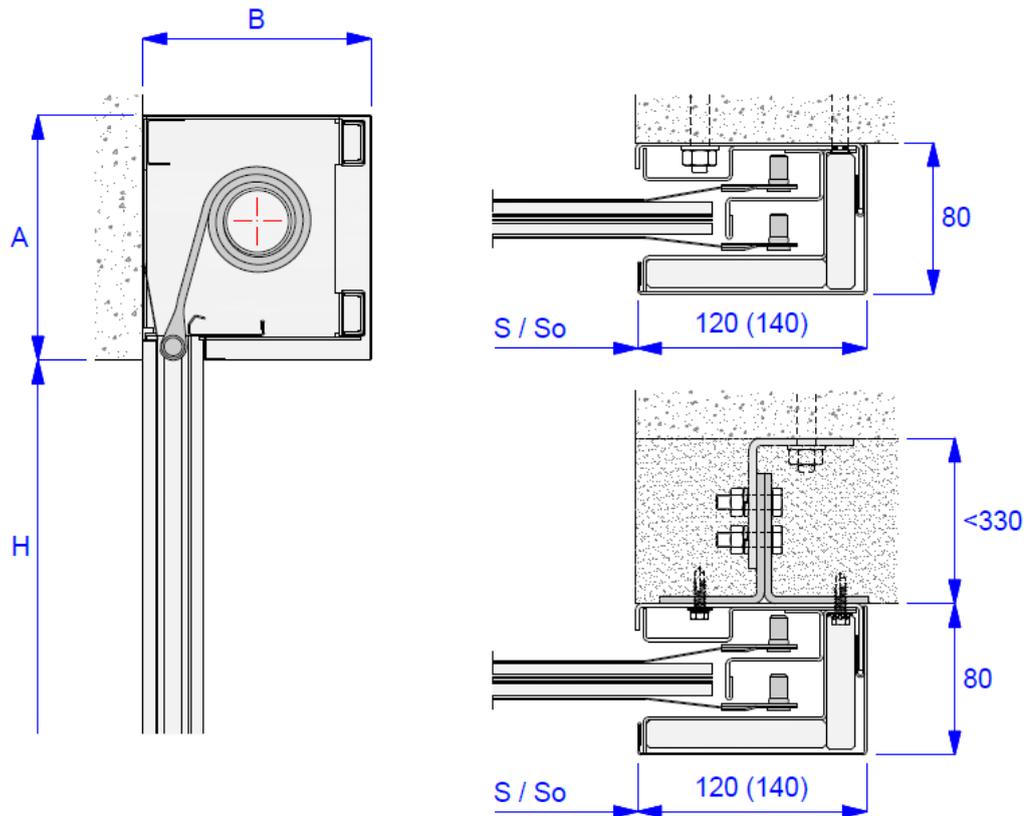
ISOiK-Ok60-01.03 MARC-Ok + EI60 fire protection curtain door – wall-mounted
